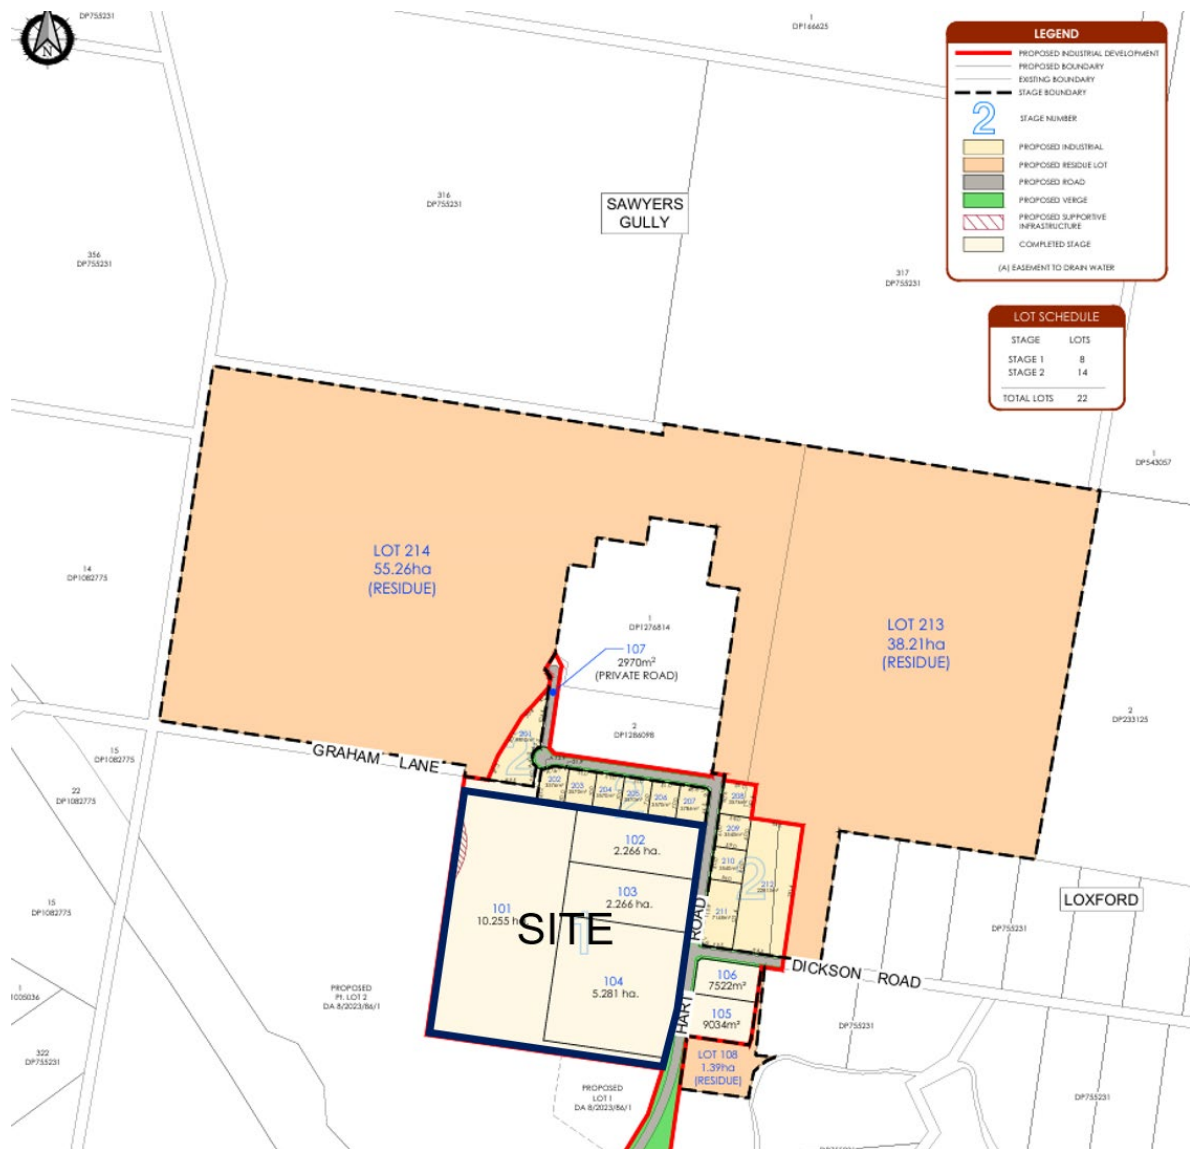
DA8/2023/85 - Proposed Subdivision Plan
